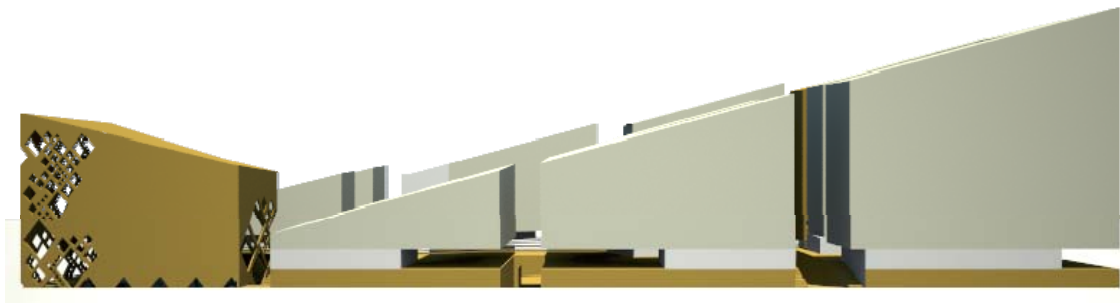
North elevation of the proposed shadow umbrella, Source: Author
